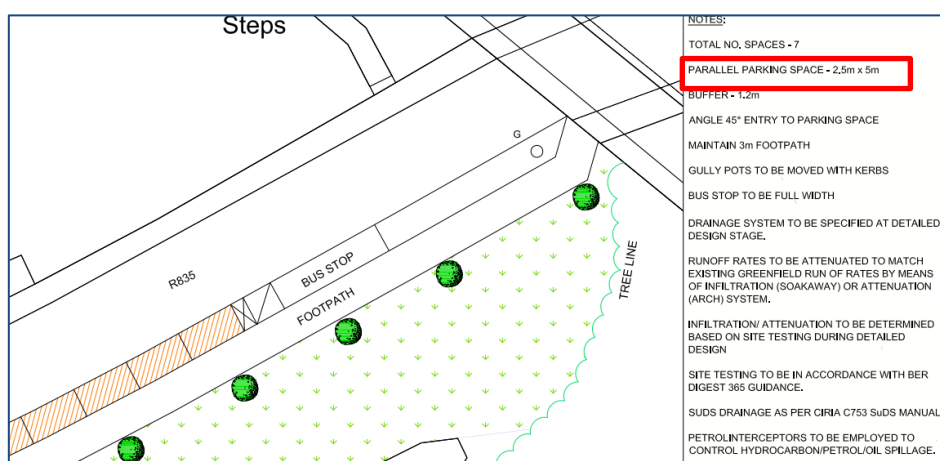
Proposed dimensions for parallel parking bays at Site A
